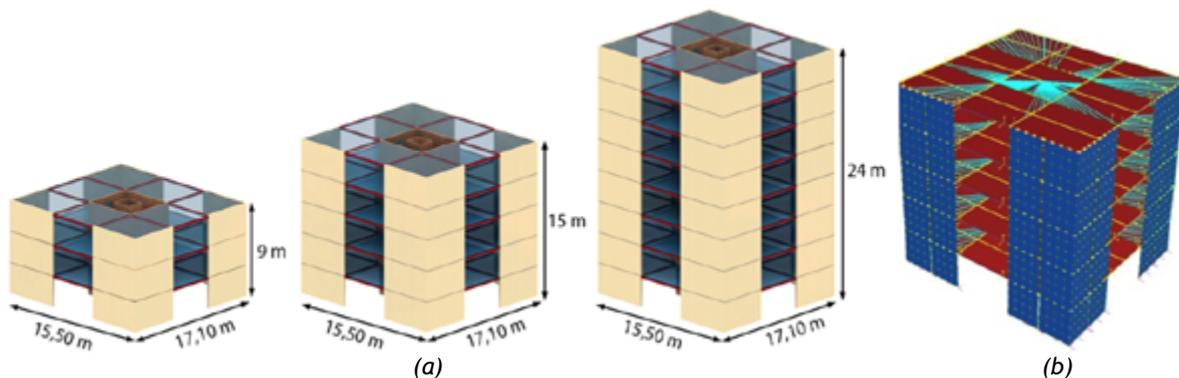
SFRS wall configurations of case study buildings (a) and typical FE model (b).
